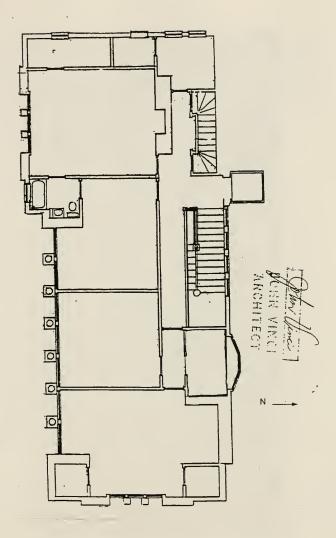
Second Floor Plan of the Heller House Courtesy of John Vinci Architects.
